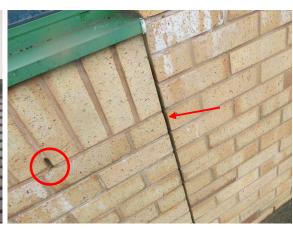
Pavilion F (east elevation) weep hole PRF below window and brickwork gap PRF.
